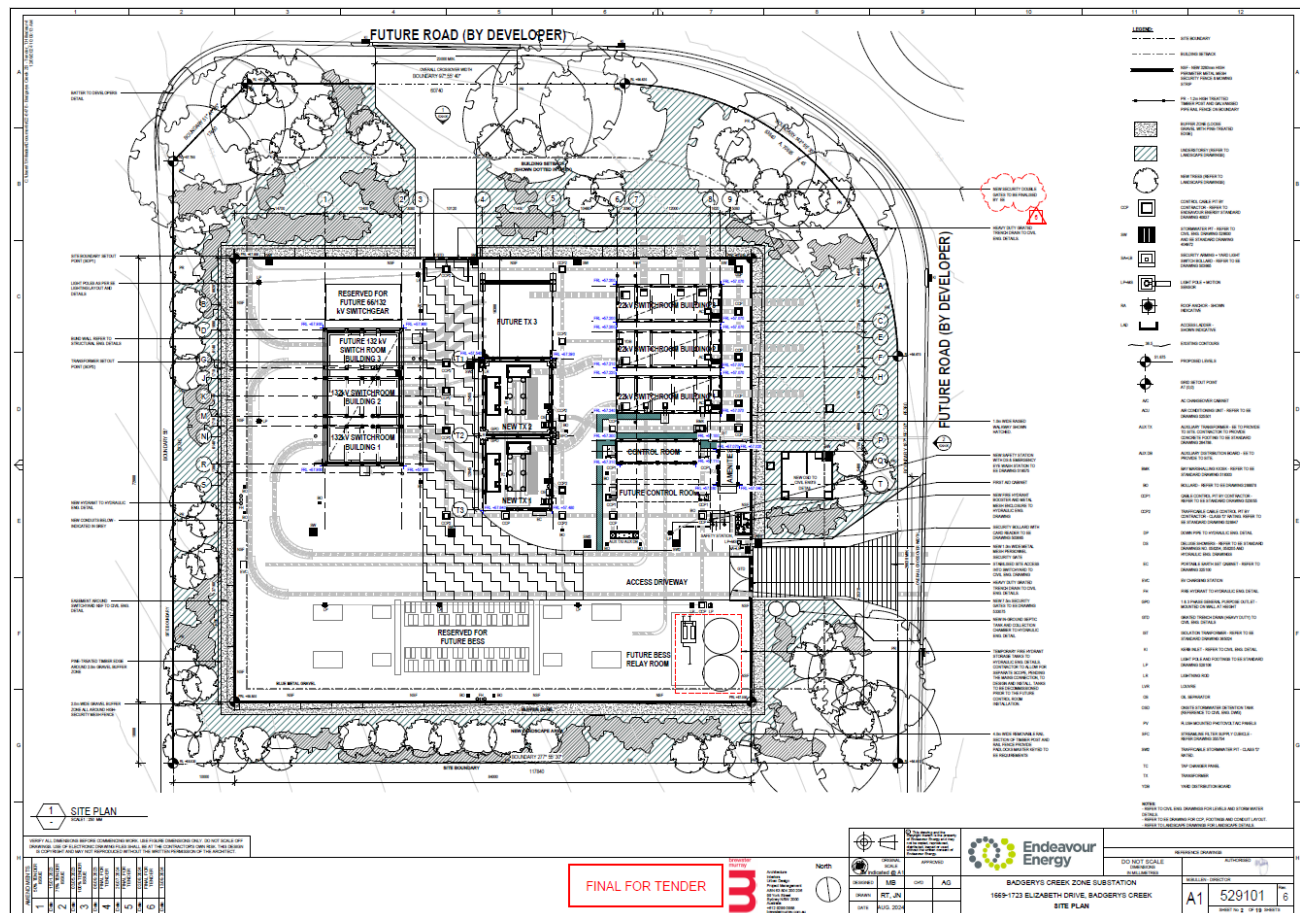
General arrangement design of Badgerys Creek Zone Substation
